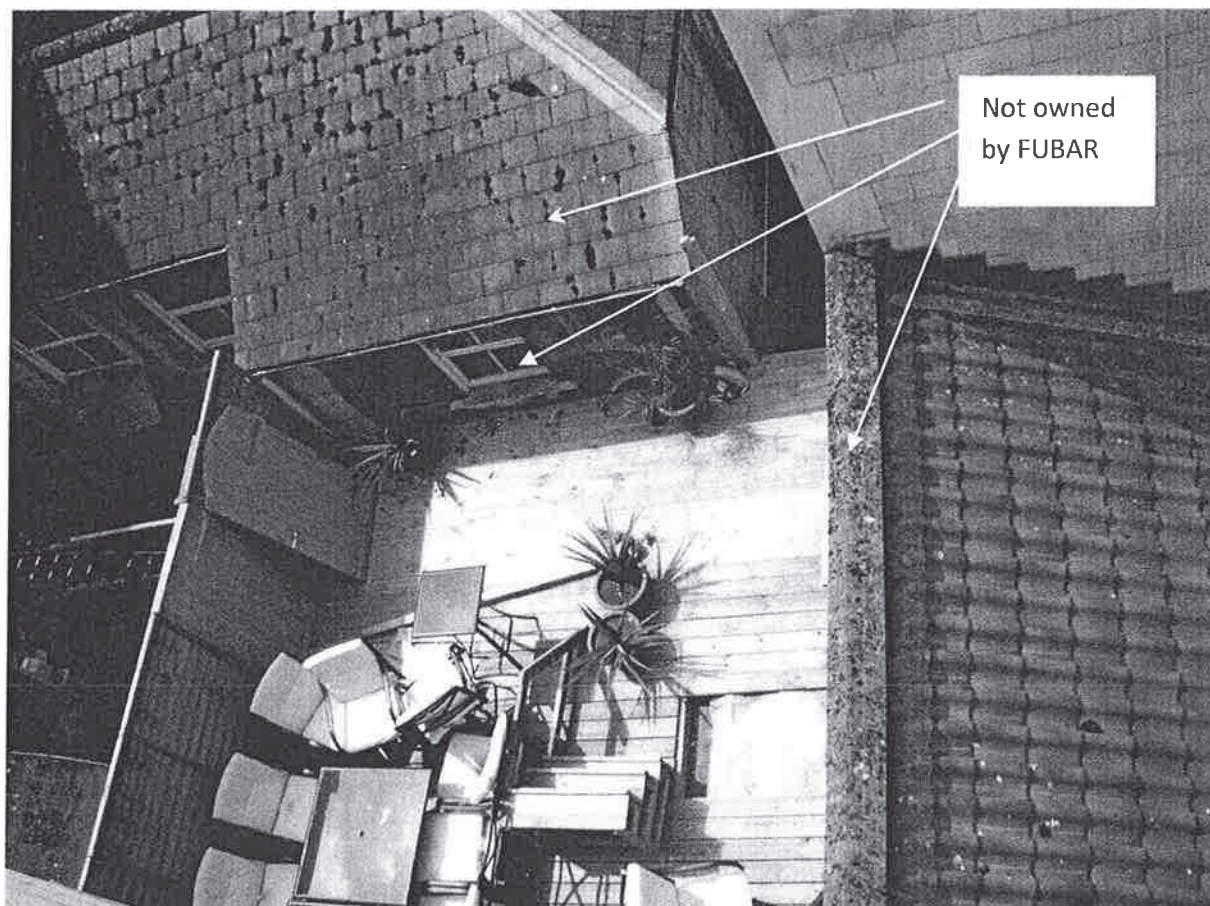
showing height of drop from perimeter wall to IPL courtyard and access to internal areas of the premises
